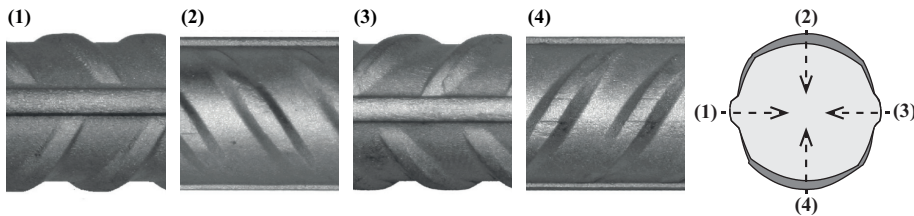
Details of the reinforcement ($d_b = 14$ mm) used for the headed bars (SB8)
